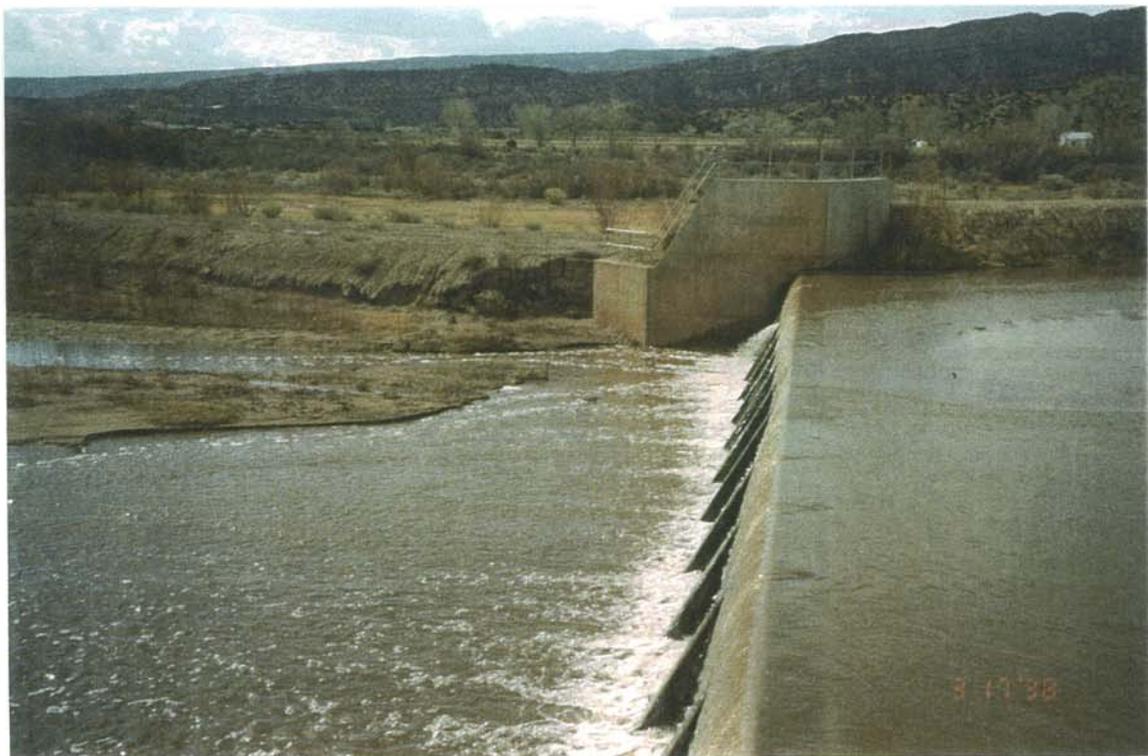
Erosion at downstream side of west abutment of new diversion dam.
